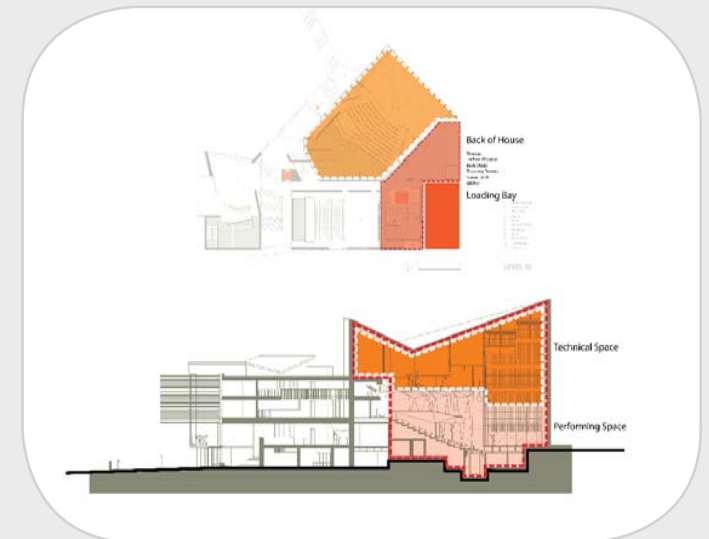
15 : Plan and section diagram, Lyric Theatre, Belfast
